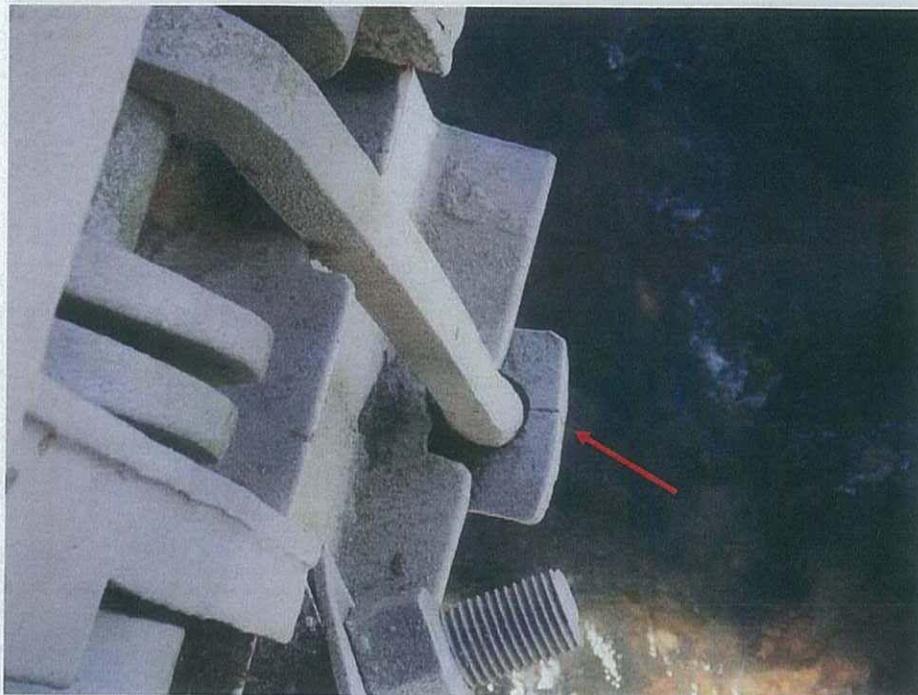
THRU-CRACK IN U-BOLT CONNECTION PLATE AT LOWER CHORD, L2 DOWNSTREAM
